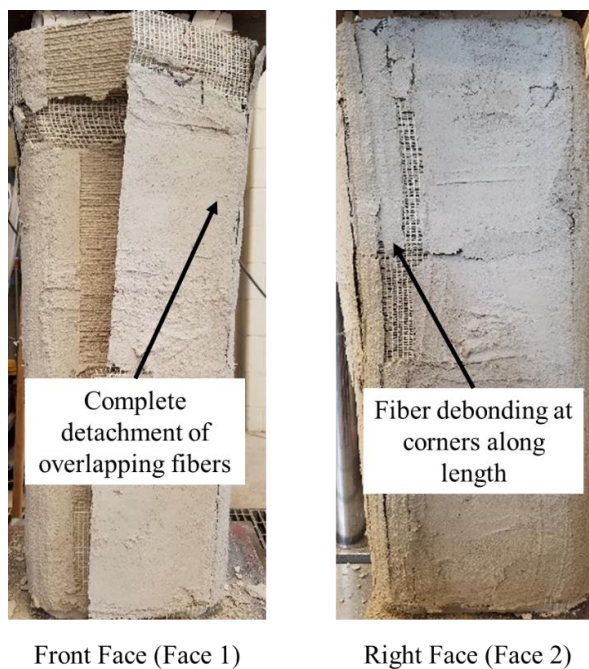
Specimen C-12-38-1-4 After Testing: Front and Right Faces
